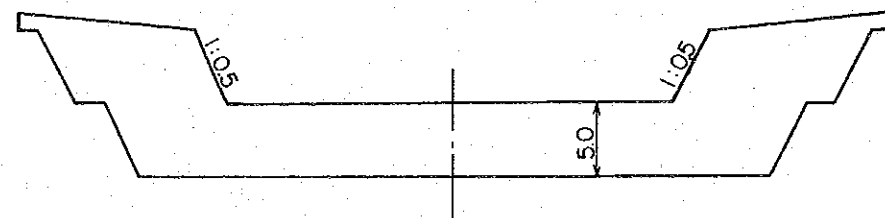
TYPICAL DESIGN OF SABO DAM (SLIT TYPE)
